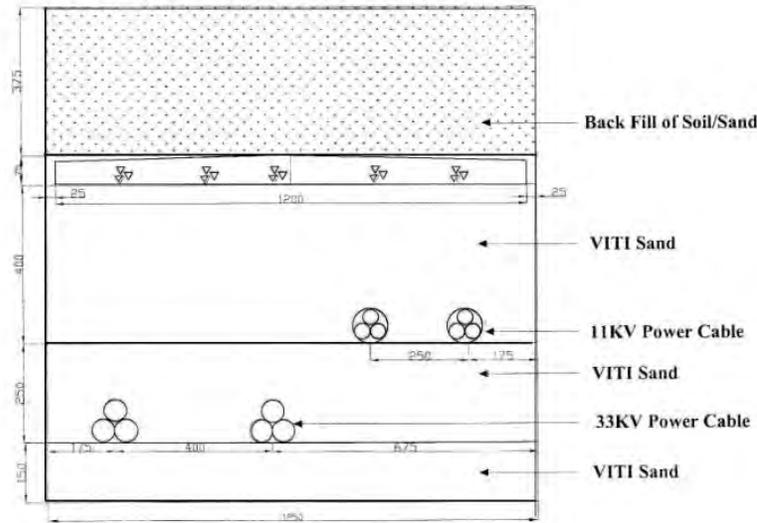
Typical Common Trench for 33 and 11 KV Cables
